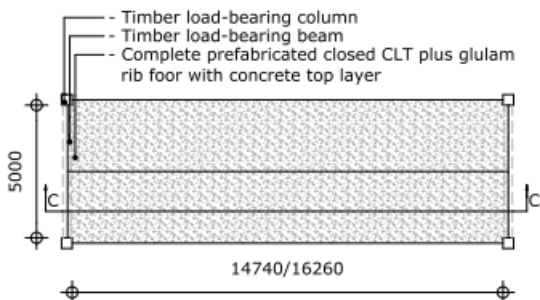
Top view floor design 3 complete prefabricated closed CLT plus glulam rib floor plus concrete in mm
